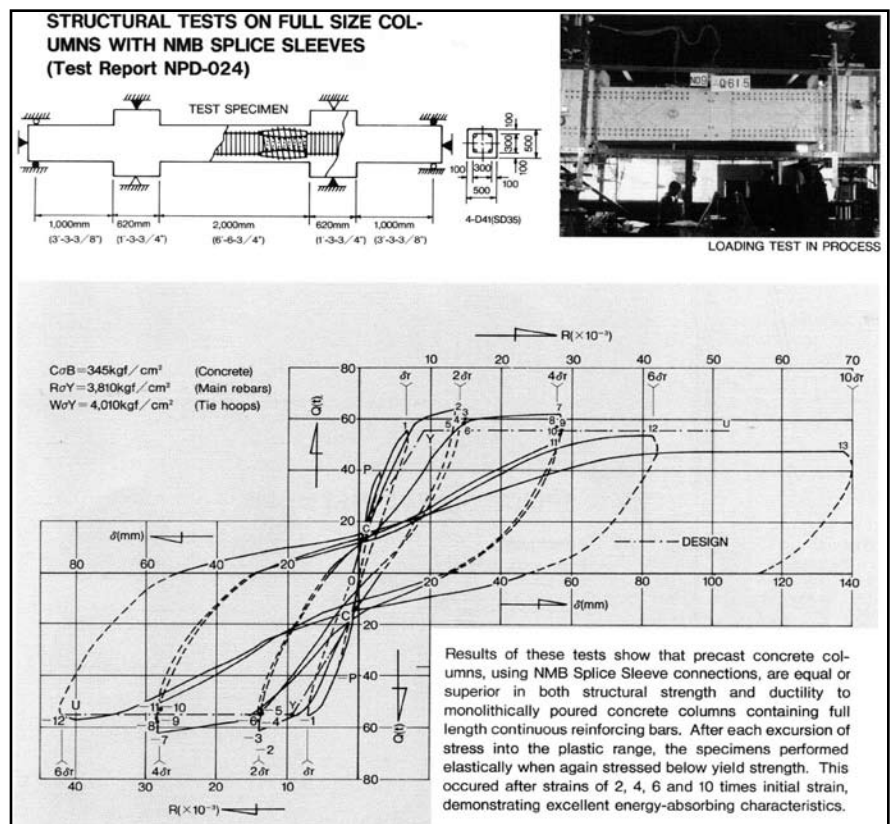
Testing reinforcing splices on full-size columns with NMB splice sleeves.
